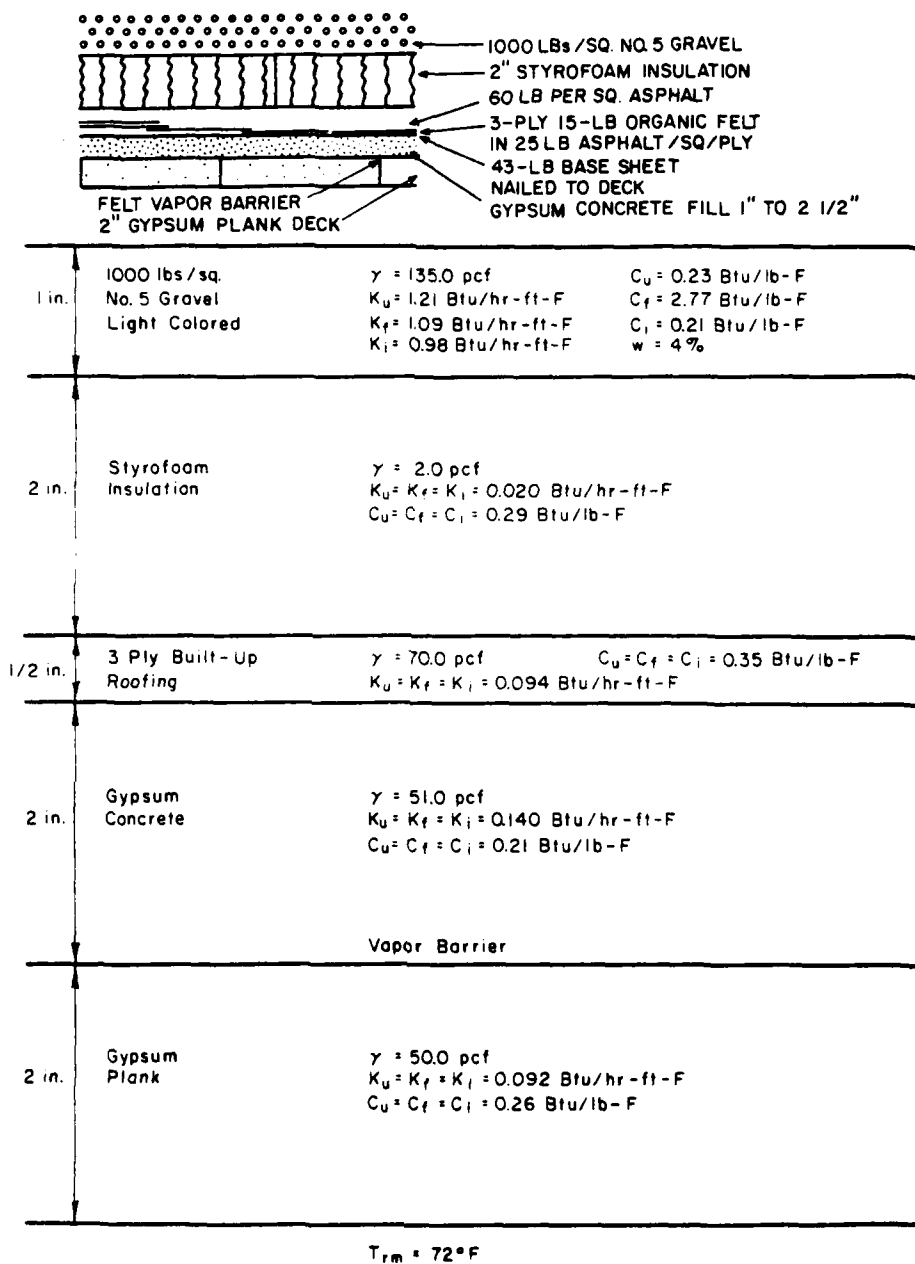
Roof system 2, Building 2, Cape Hatteras, NC.
